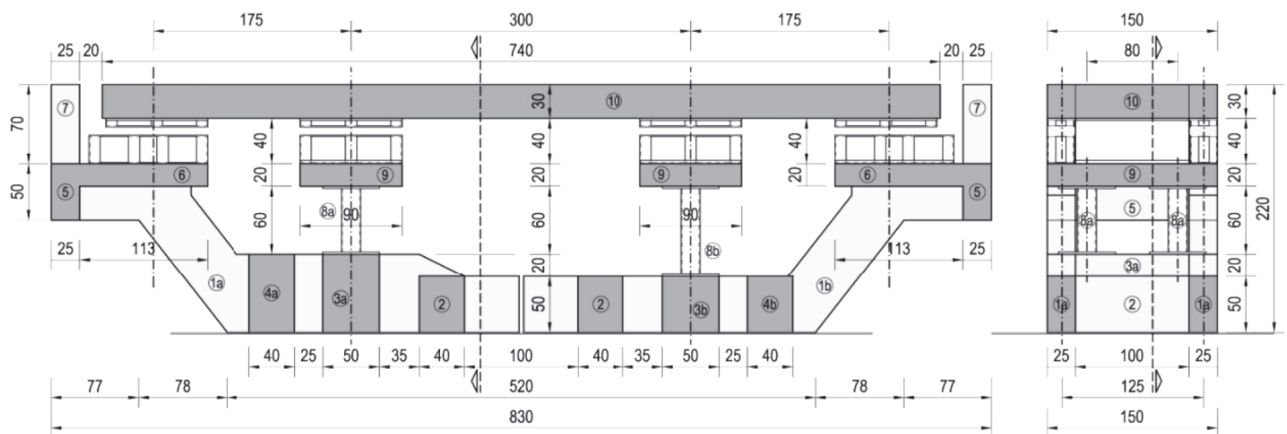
ISUBRIDGE bridge test model geometry: Longitudinal and transverse sections
